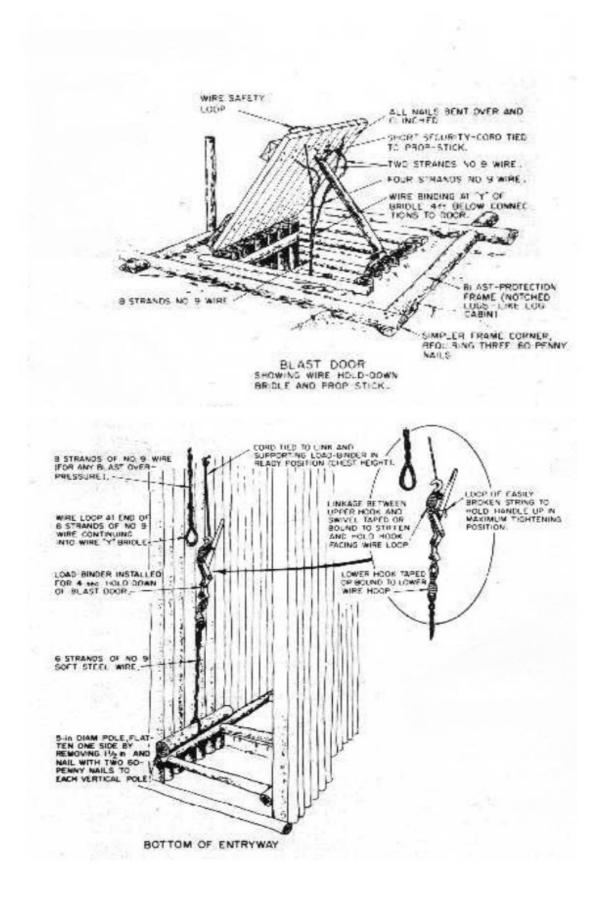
shows a blast door made of 5 thicknesses of 3/4-inch exterior plywood, well glued and nailed together with 4-1/2-in. nails at 4-in. spacings. This door was protected by 4 blastprotector logs, each 8 feet long and about 8 inches in diameter. The logs were notched, nailed together, and surrounded with earth. For protection against ignition by the thermal pulse from an explosion, exposed wood and rubber should be coated with thick whitewash (slaked lime) or mud, or covered with aluminum foil.
